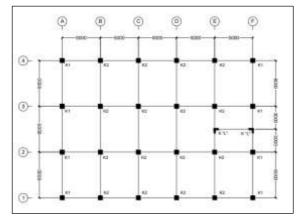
1st = 2nd = 3rd Story Columns Plan
